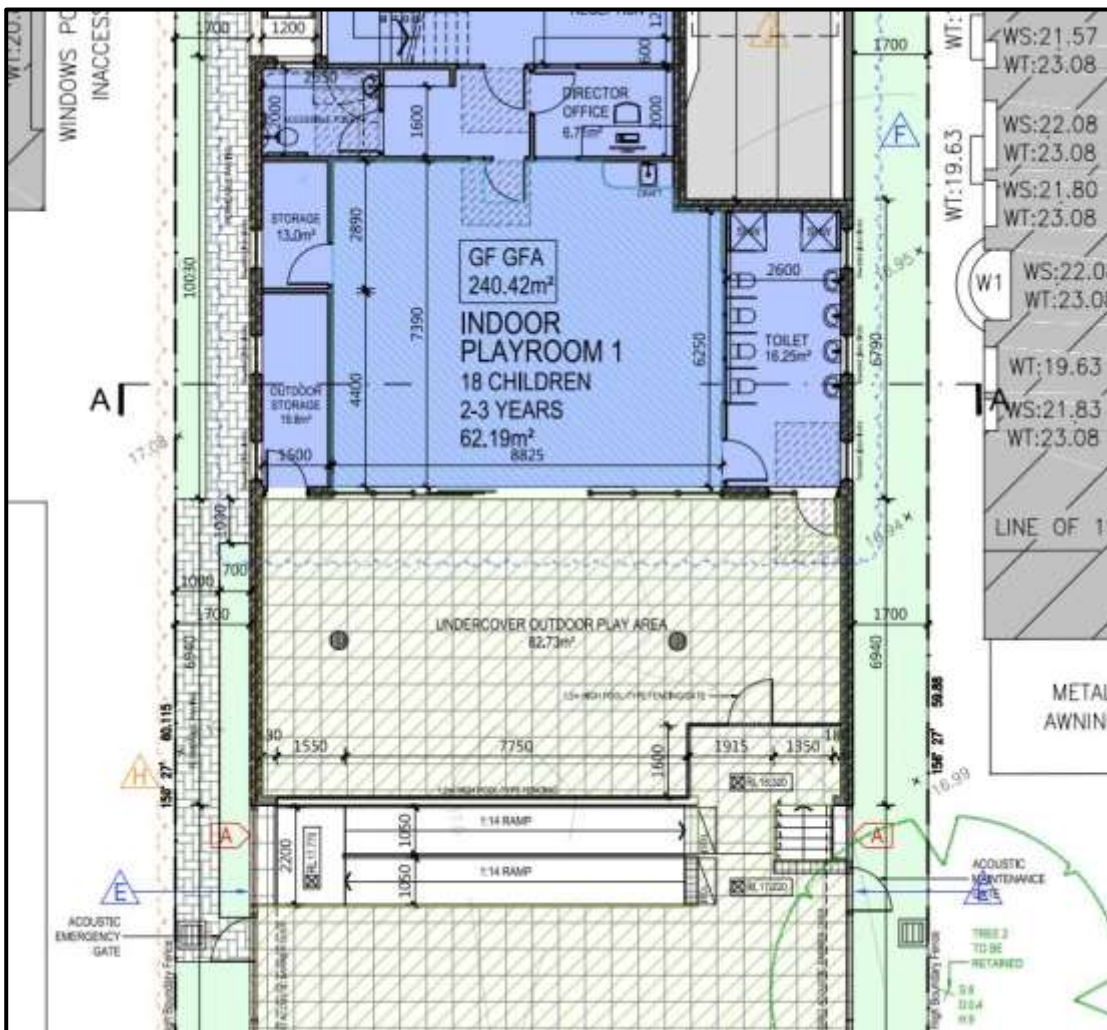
Approved ground floor showing Indoor Playroom 1 bathroom and child resistant barrier on the corner of outdoor play area.
